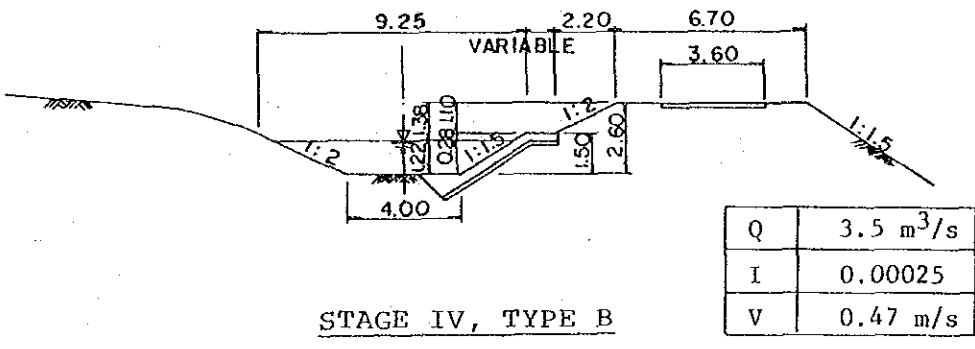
STANDARD CROSS-SECTION OF MAIN CANAL(2)
